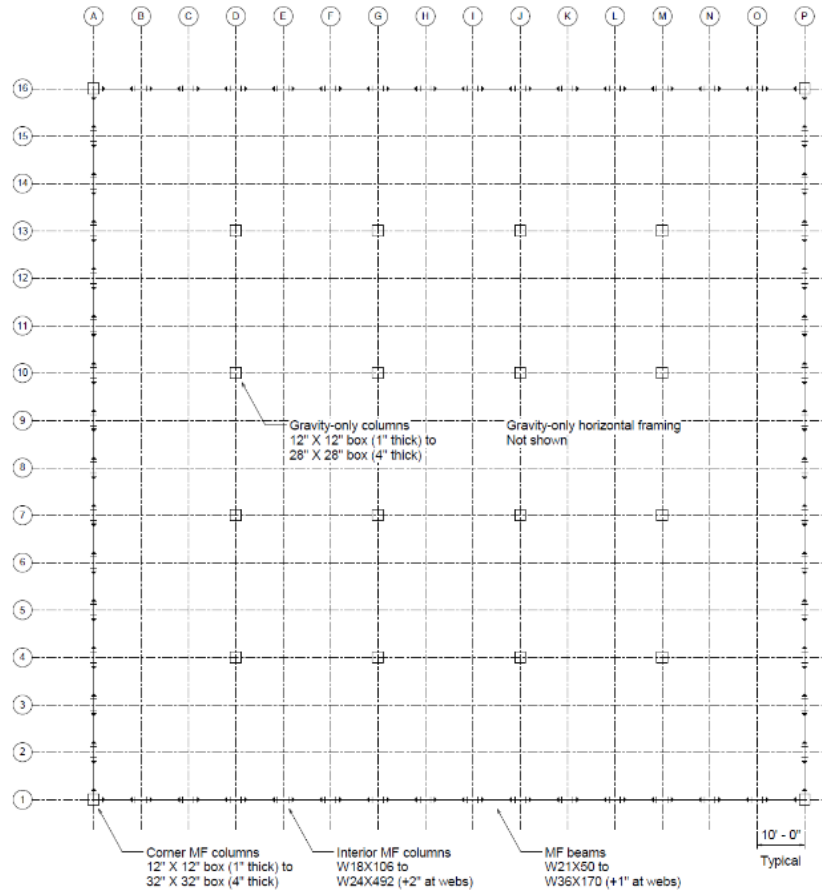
Plan view of typical story for 55-story SMF design (image provided by Dr. Abel Dizon).
